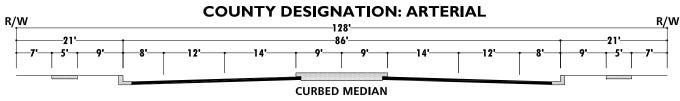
SITE ADJACENT ROADWAY RECOMMENDATIONS
